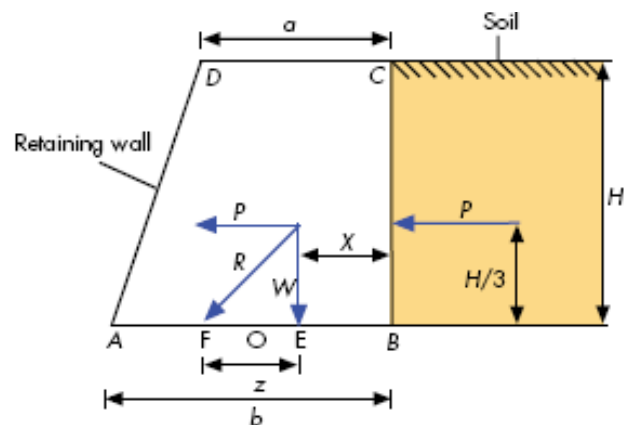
Gravity retaining wall showing the dimensions (ICMOD, 2008)
